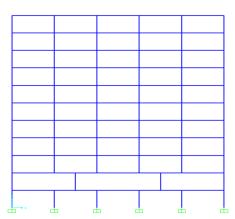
Model 3 - Building with floating column at 1<sup>st</sup> floor
